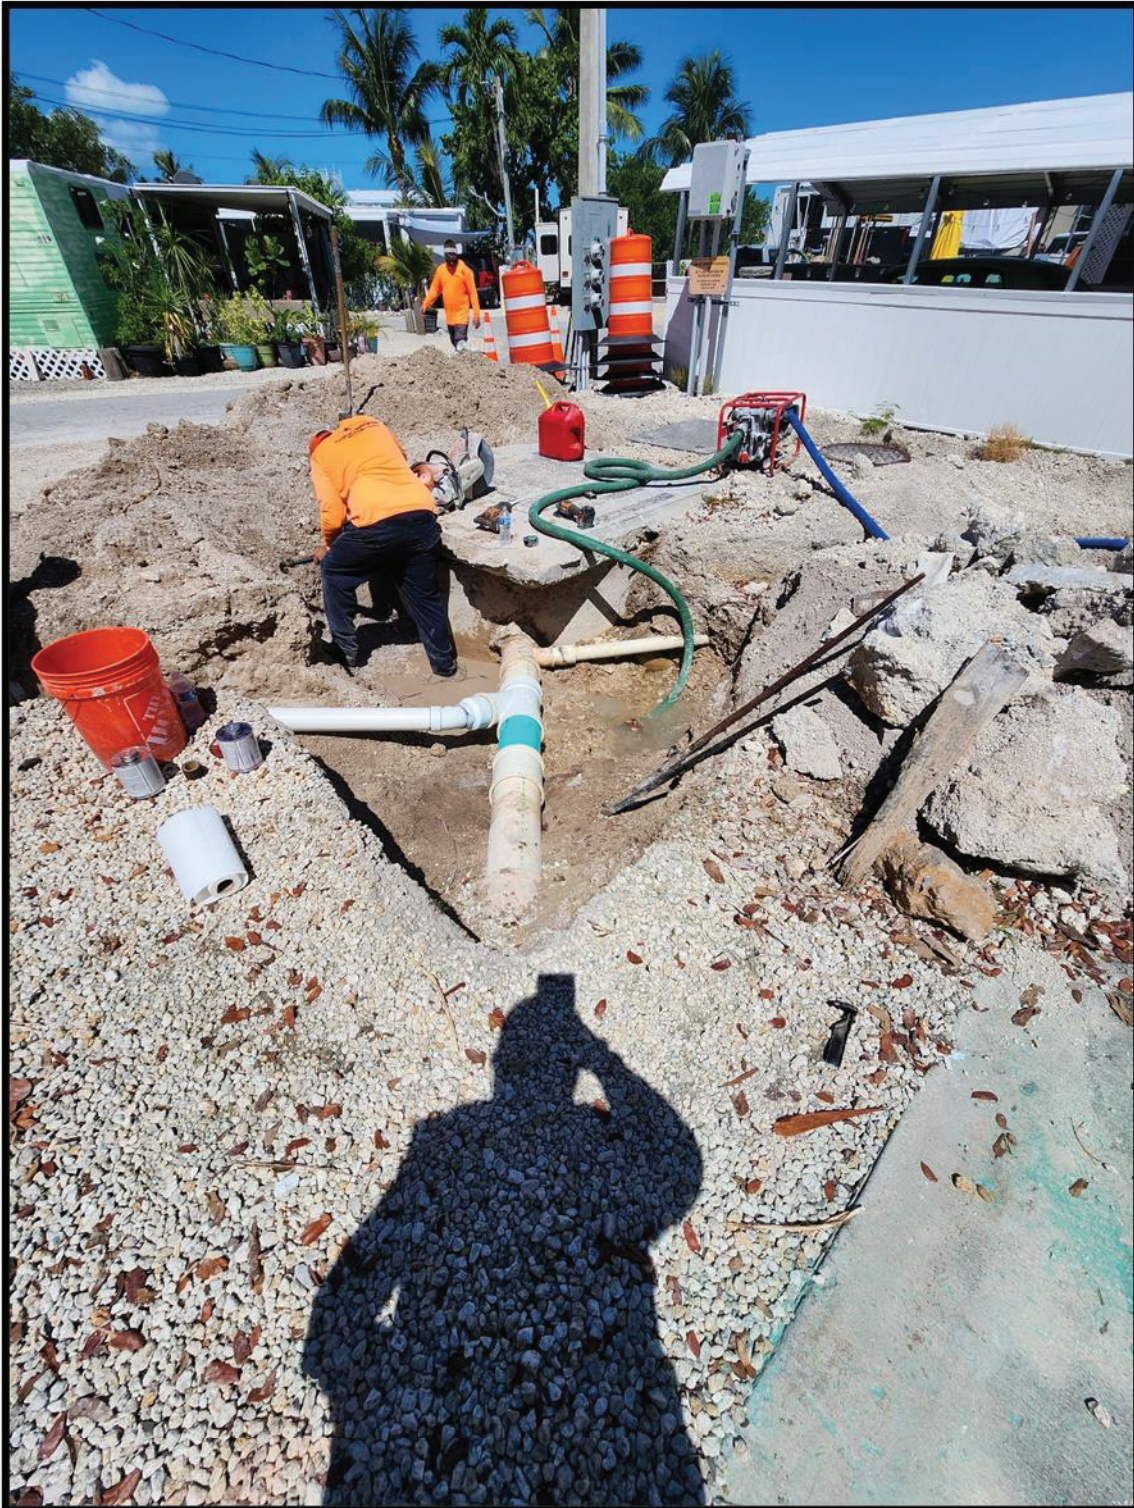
Keys Holding installing new pipe work for the lift station. Section of 8"SDR-26 PVC, 8"x6" PVC WYE, and 6"x4" PVC Reducer Installed at Southeast Side of Existing Lift Station.
